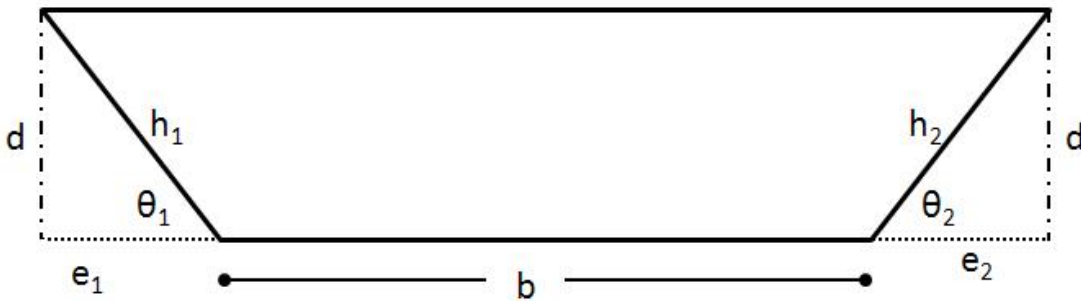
Cross section of canal in the shape of a trapezoid. The cross sectional area  $A$  is to be fixed to maintain fixed fluid flow.
